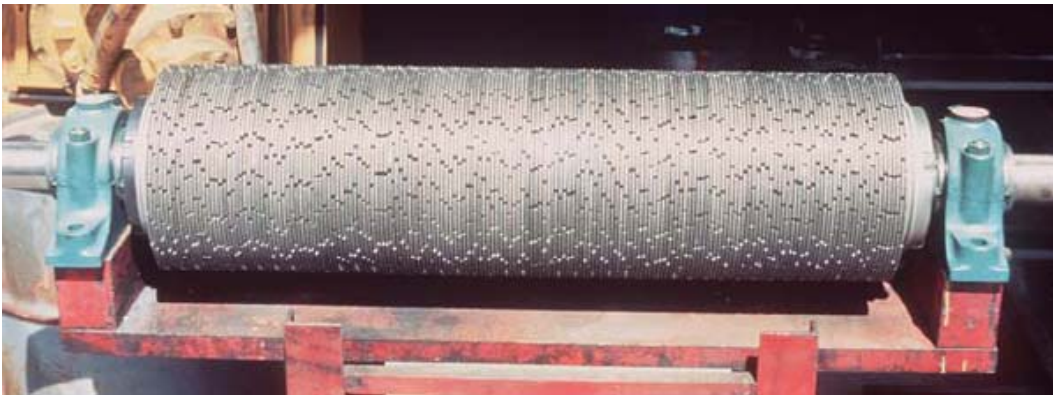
Typical cutting head (Courtesy of Caltrans)
